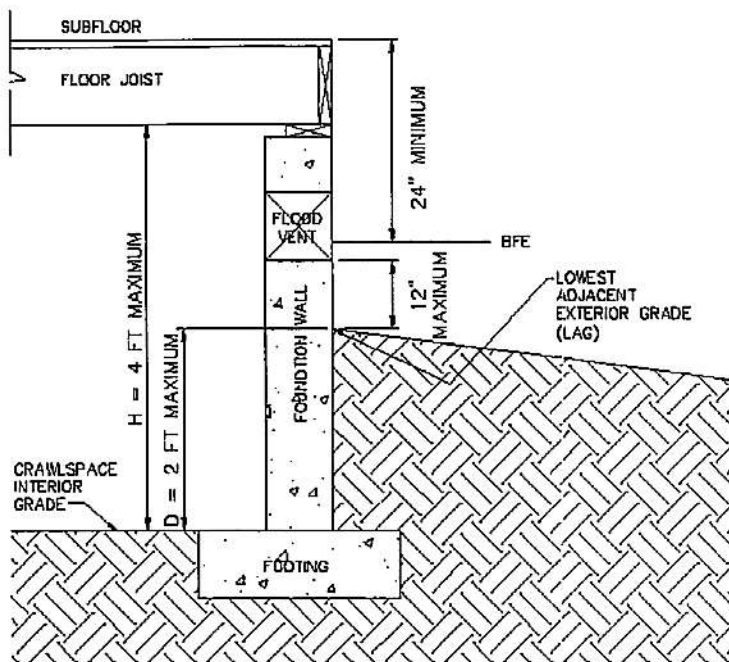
Below-grade Crawlspace Construction (Note: A below-grade crawlspace shall be subject to higher flood insurance rates through the NFIP.)
